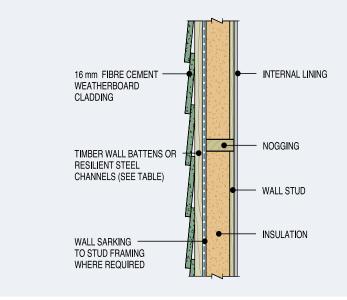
16 mm Fibre Cement Cladding. Vertical section through wall
